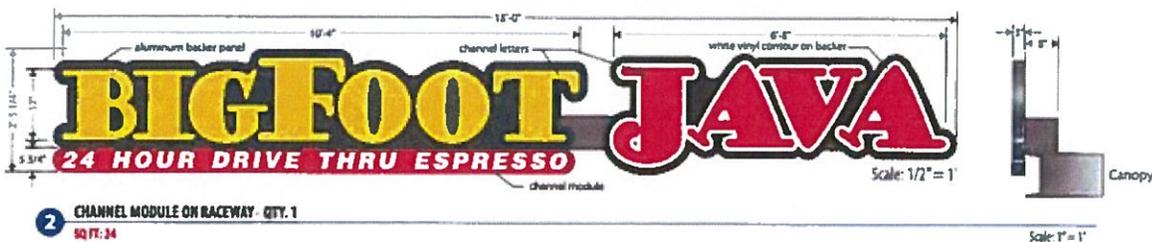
Proposed Building-Mounted Drive-Thru Sign (Signs #3a and 3b on Exhibit 4 Map)
